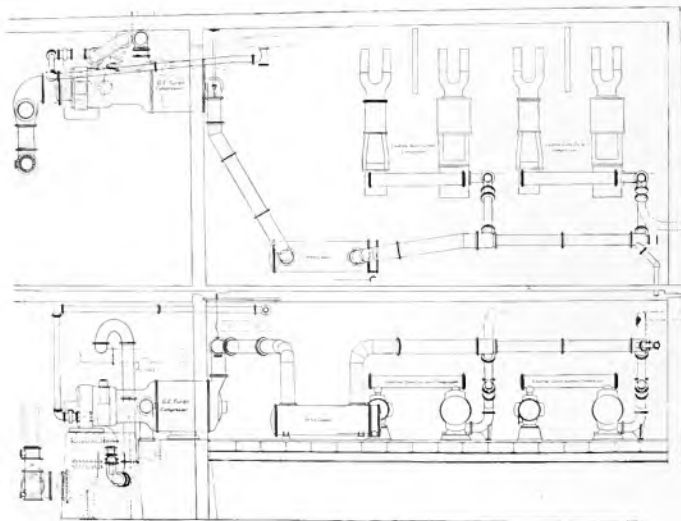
Plan and Elevation of Installation of Curtis Turbo Centrifugal Compressor
